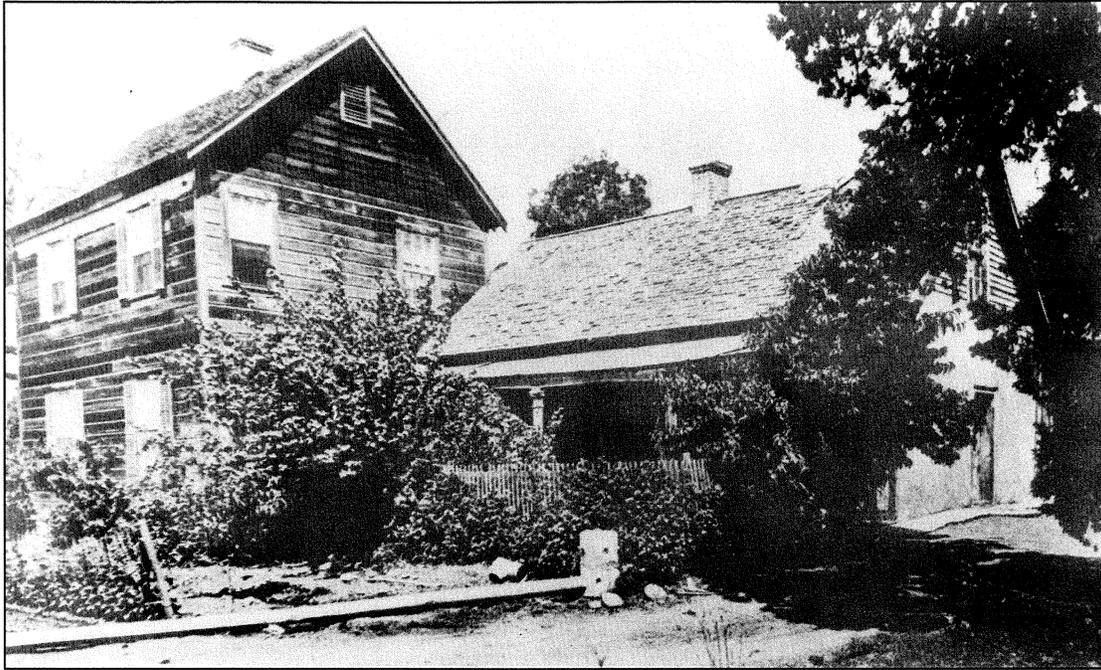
South elevation (left) and east elevation of south wing (right), note two story wood frame addition, view north west (San Marino Historical Society, nd)
